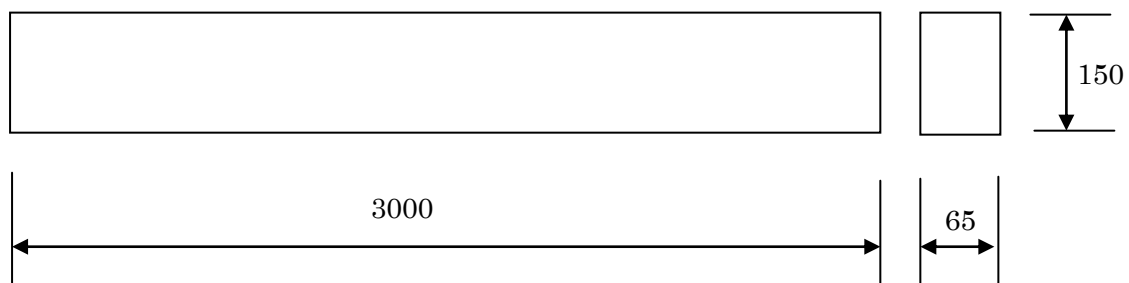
Shape and dimension of specimen used in the tensile test (dimension in mm)
